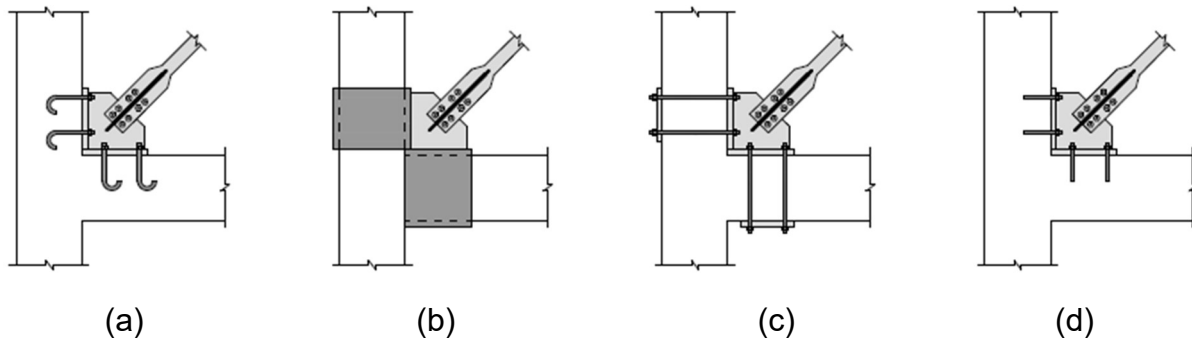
Schematic depiction of direct connection solutions using (a) pre-cast hooks, (b) steel jackets, (c) bolted-through connections, and (d) post-installed anchors.
